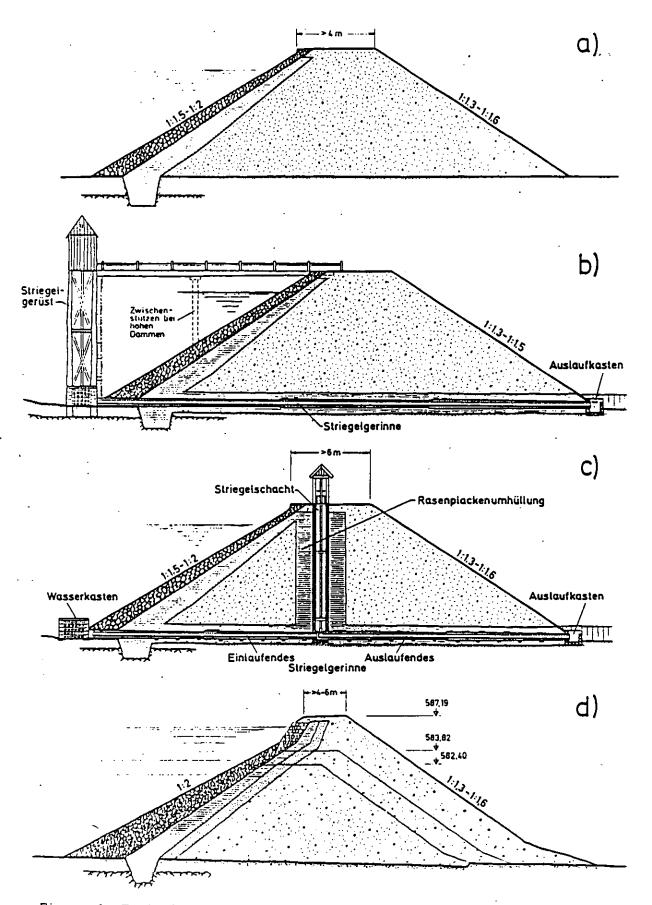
Typical cross sections of mining dams in the Harz mountain area
